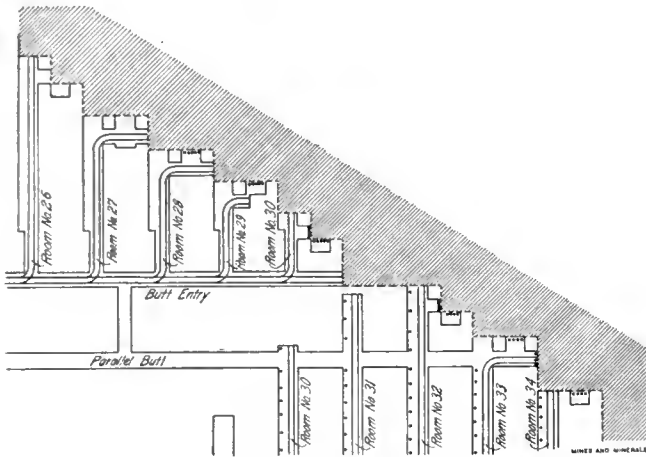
RIB WORK SHOWING METHOD OF WORKING ENDS OF PILLARS
